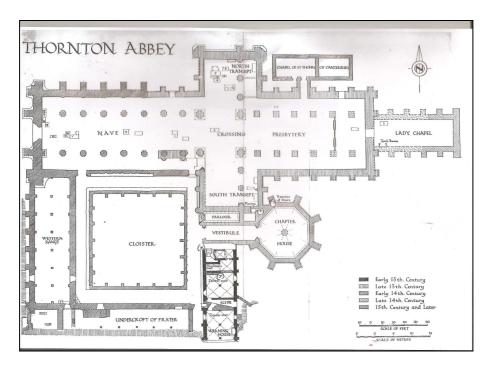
Architectural plan of church and cloistral range at Thornton Abbey.
